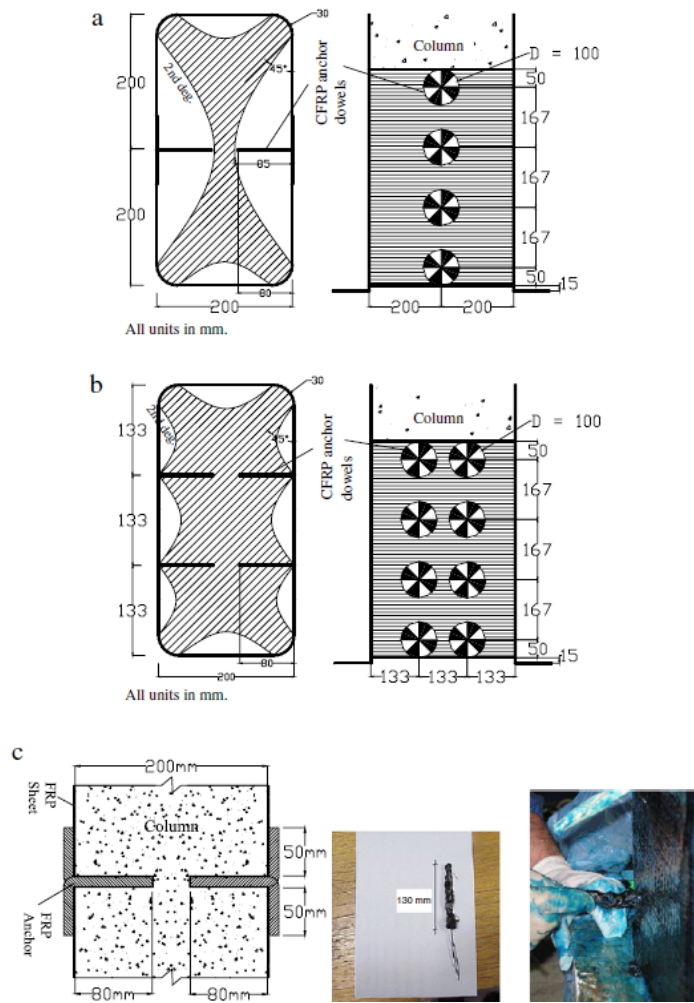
(a) CFRP anchorage configurations for 8-pinned and (b) 16-pinned type, (c) CFRP anchor dowel detailing (Ozcan et al. 2010)
